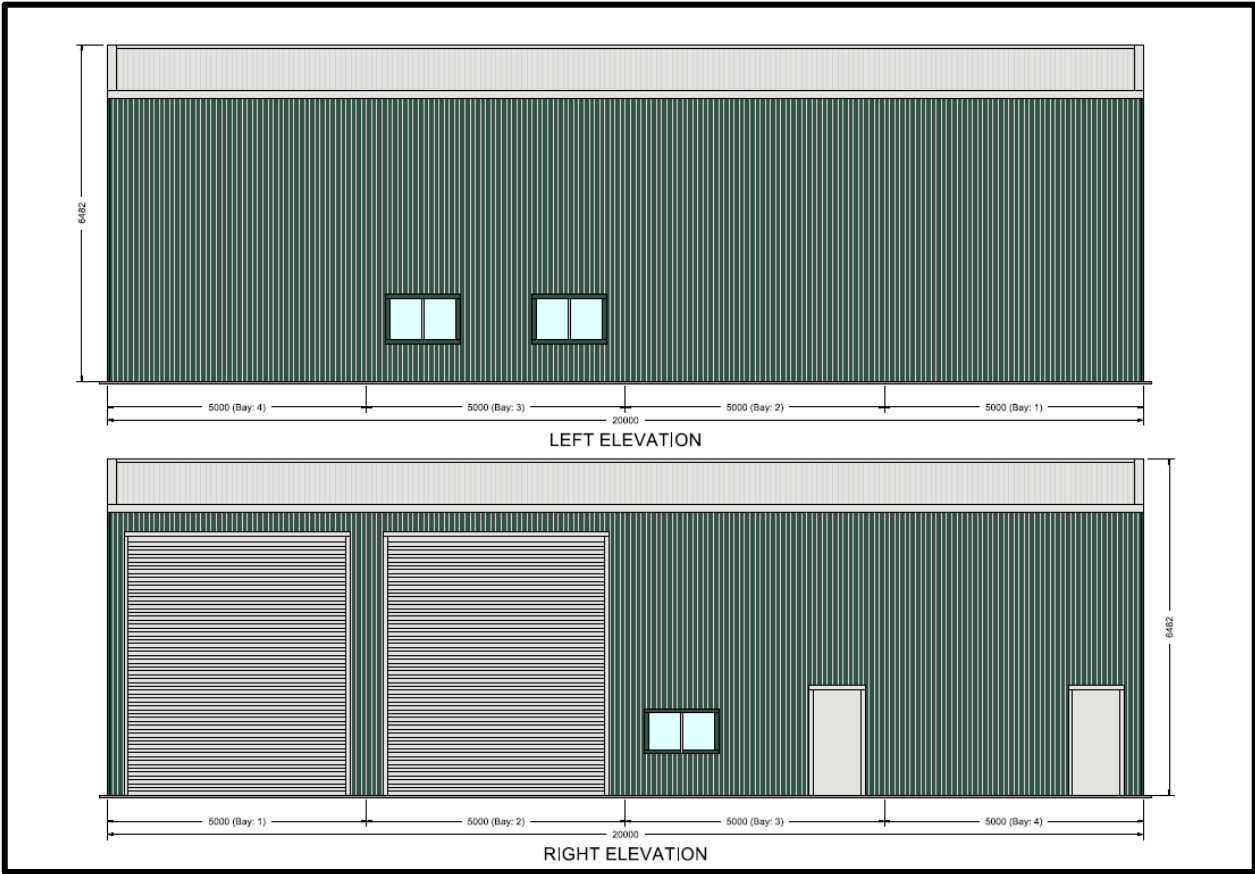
Elevations of Shed and Office (Source: Tumut River Sheds)
